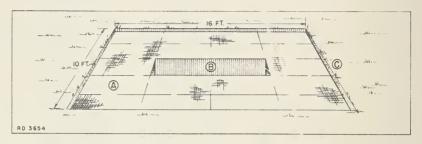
Method of flyproofing latrine pit. A—Oil soaked burlap extending completely around pit. B—Opening of pit. C—Side wall of excavation in which burlap is placed.
